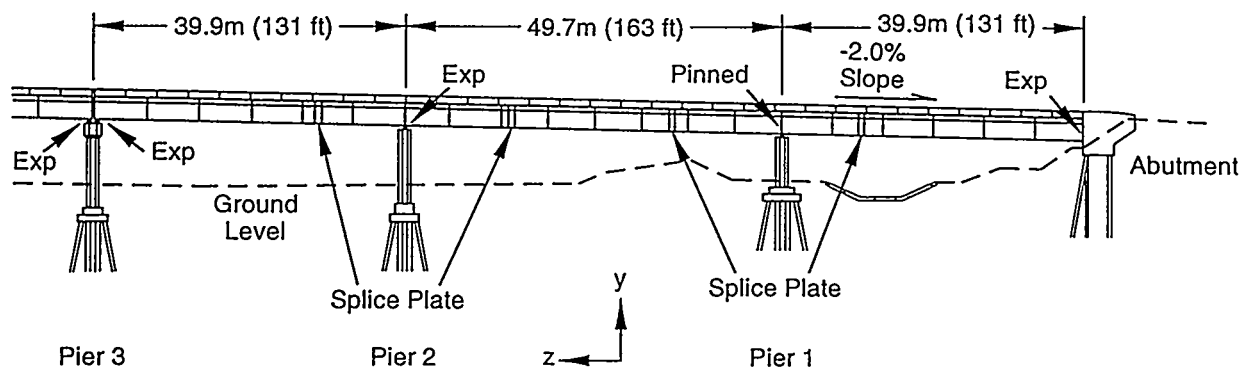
Elevation view of the portion of the eastbound bridge that was tested.
